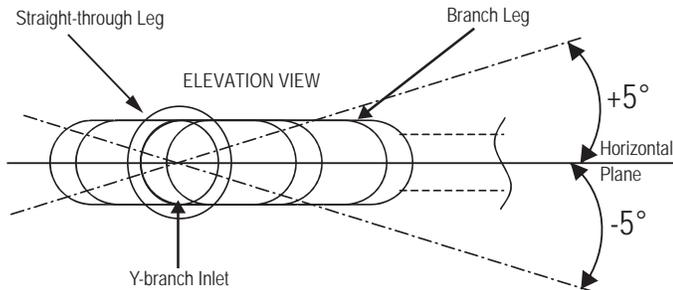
Diagram of an Incorrect Outdoor Unit Y-branch Installation.
